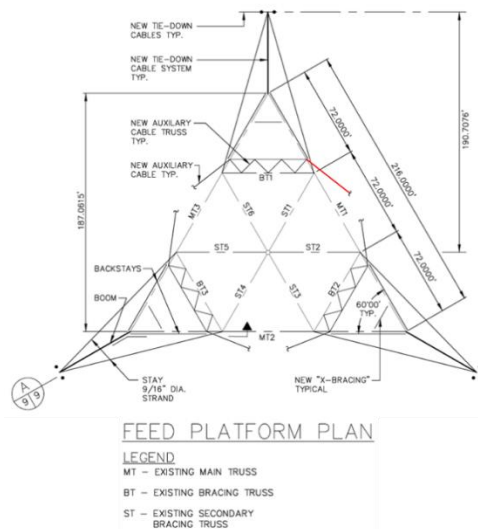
Feed Platform Plan, Drawing S-9, highlighting Failed Aux M4N Cable in Red
